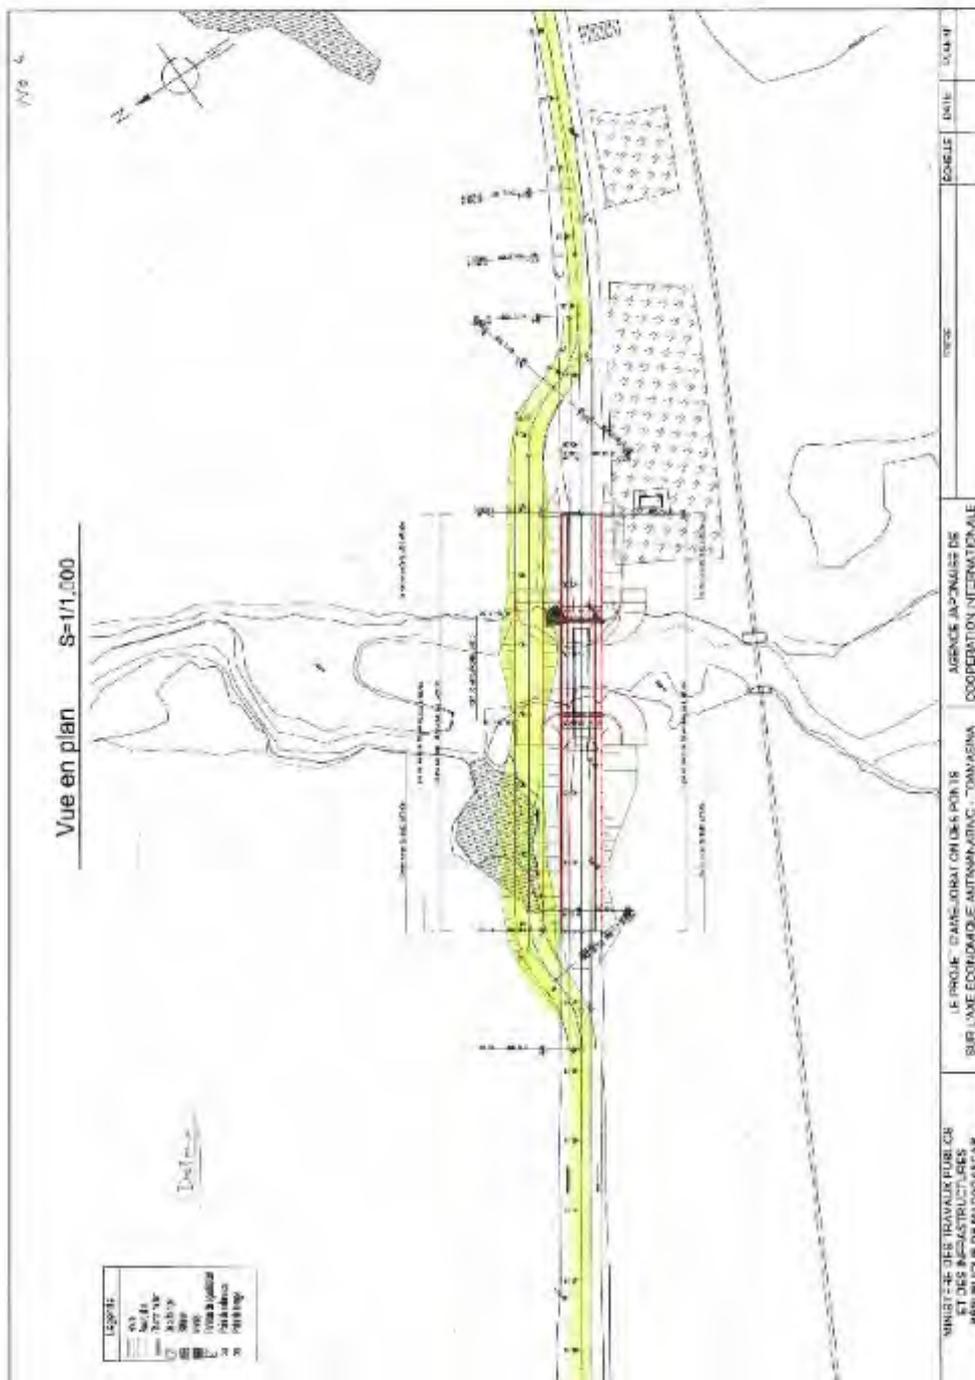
ANTSAPAZANA NEW BRIDGE
